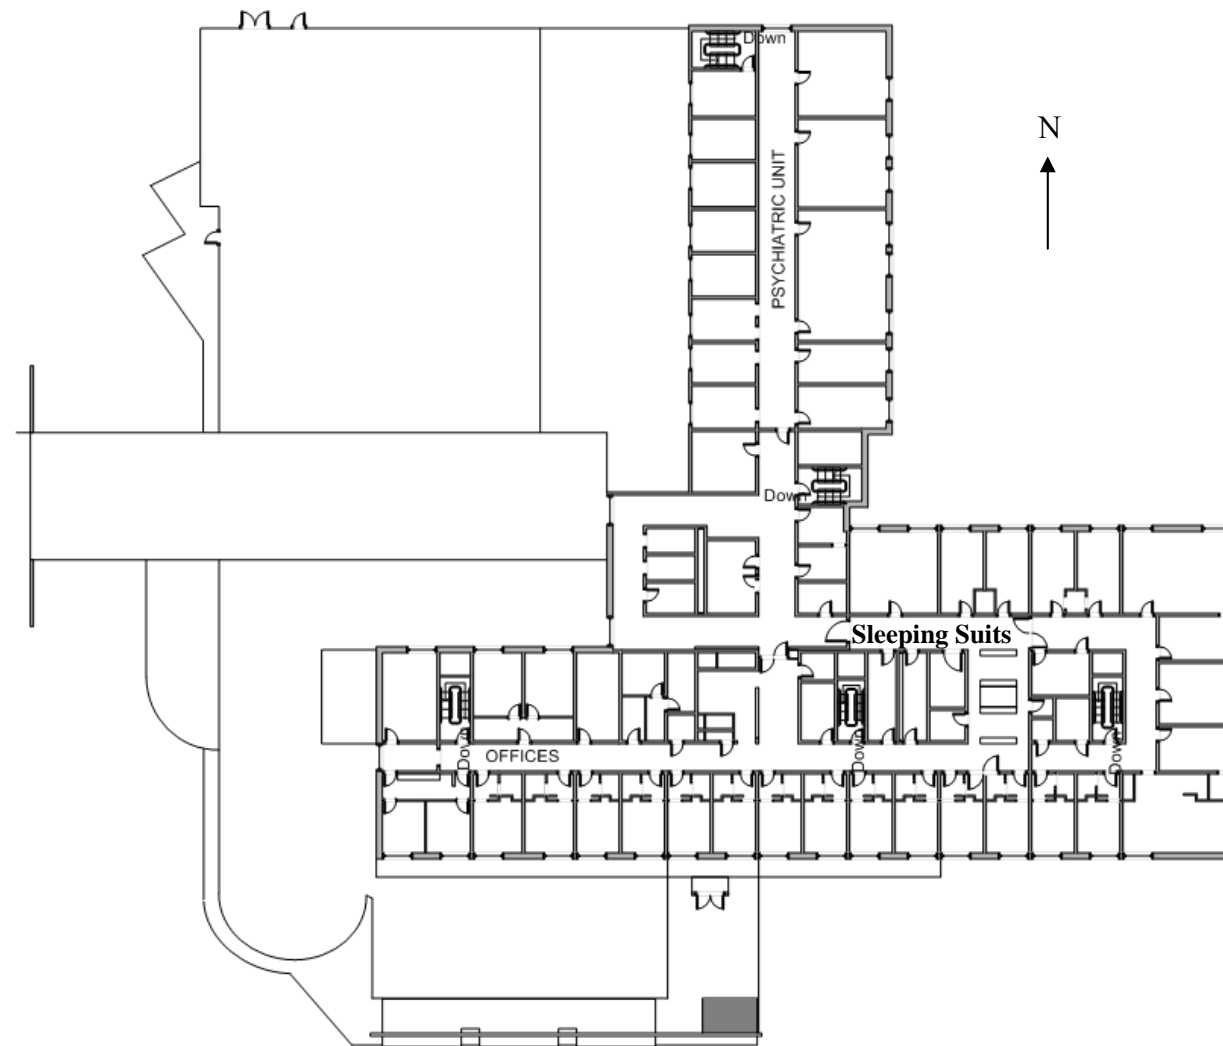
Plan view of floor 4 in hospital (not to scale)
